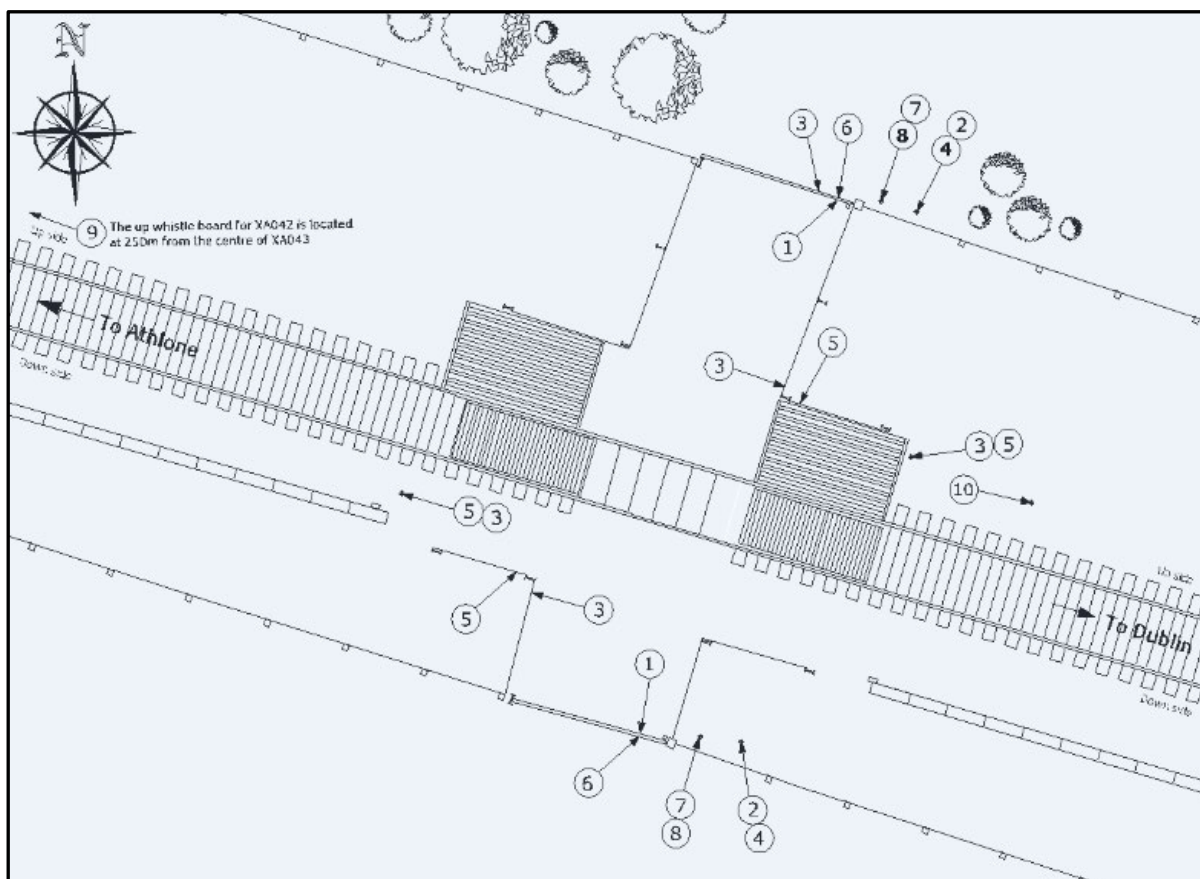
Key Plan showing locations of signage and the general layout of level crossing XA043.
